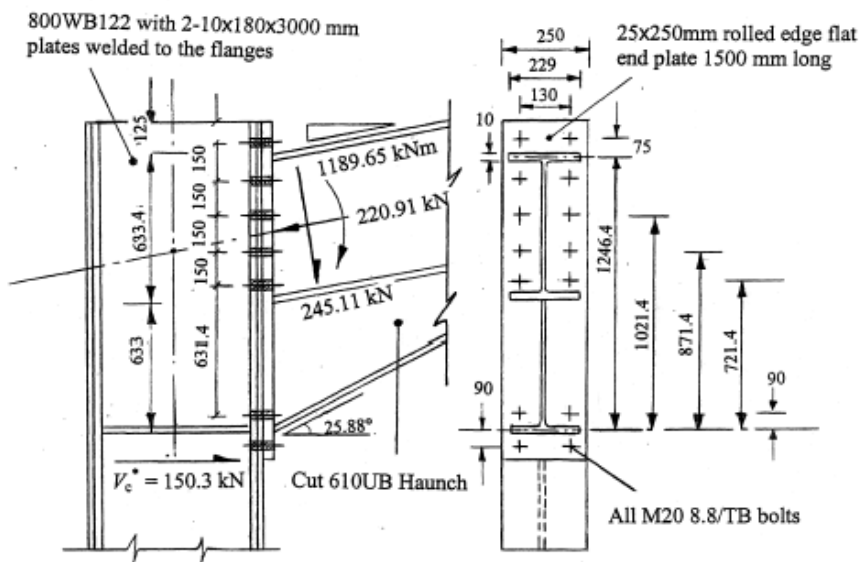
Bolted End Plate for Eaves Connection of Pitched Roof Portal Frame
